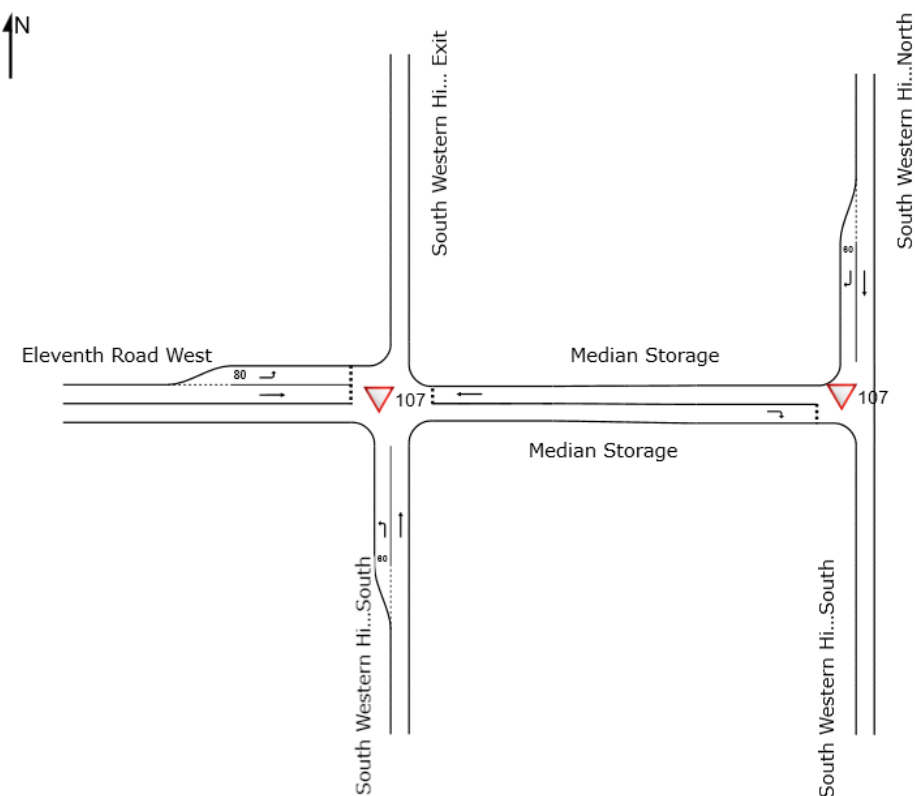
SWH/ Eleventh Road – two staged intersection layout – without SWH duplication
